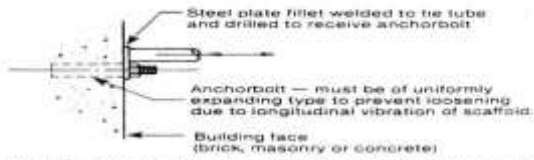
Anchor bolt tie. Vertical or horizontal section through wall where no openings or members are available for tying to.
